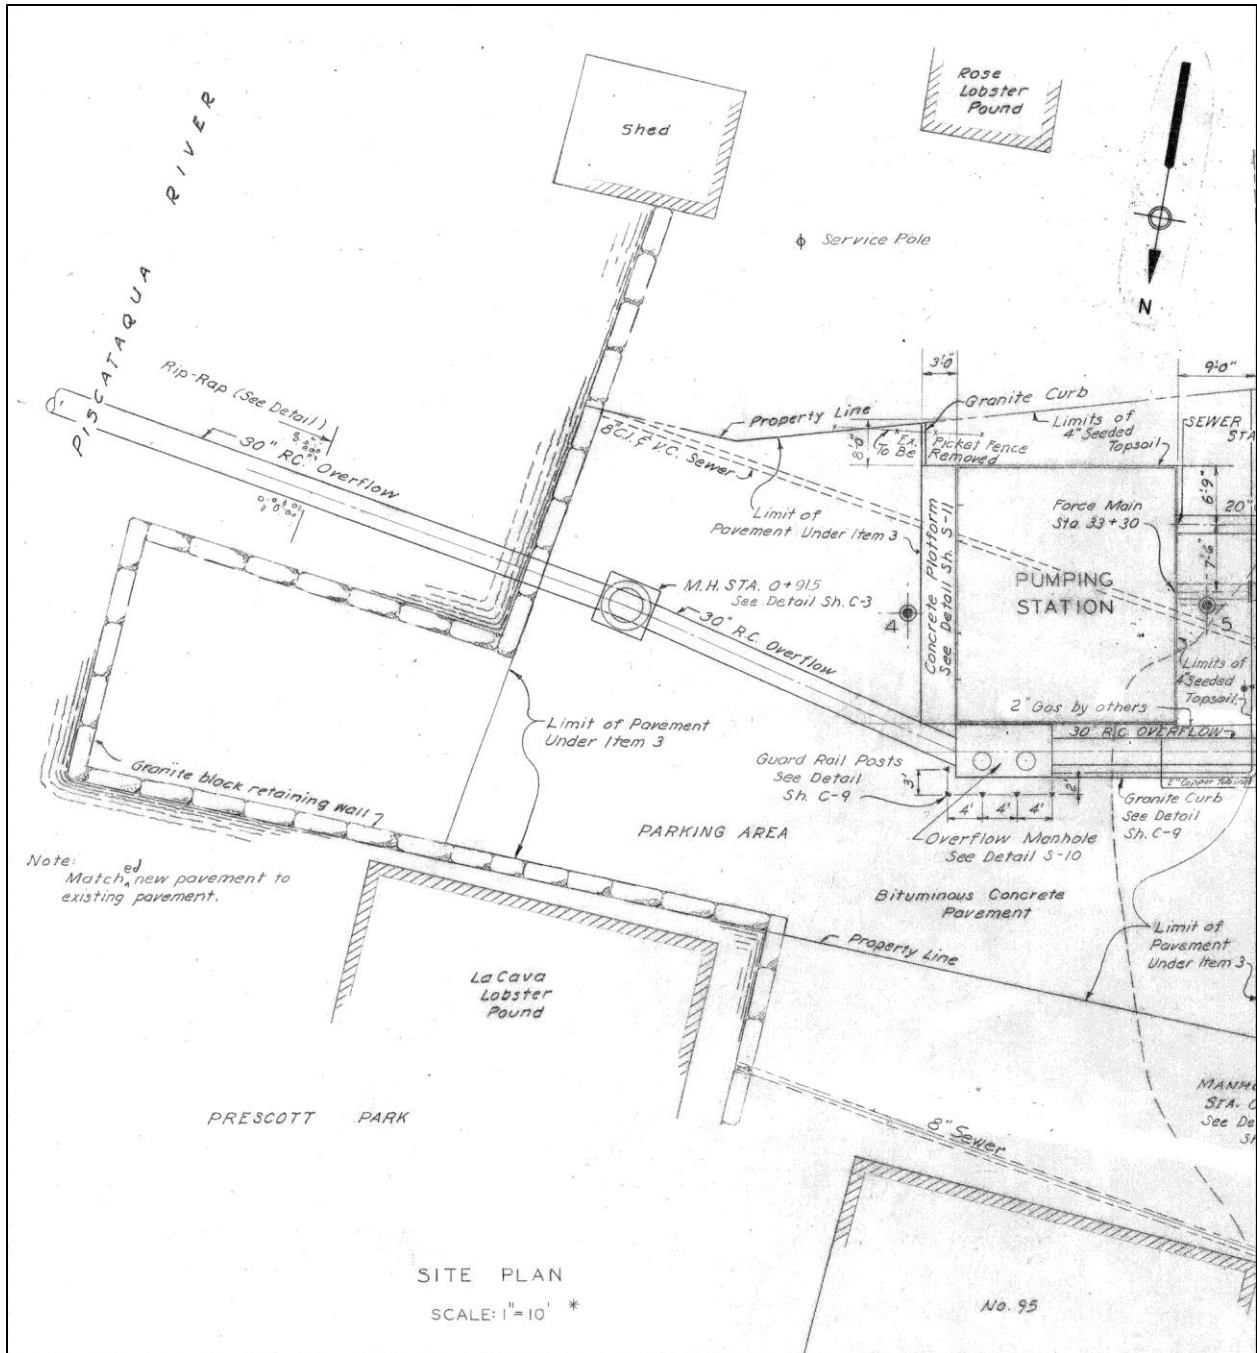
Record drawing of Portsmouth Sewage Treatment Plant, Mechanic Street Pump Station, March 1963, showing "LaCava Lobster Pound" prior to extension of wharf out to line of granite retaining wall. Note 8" sewer outfall discharging out stone bulkhead at lobster pound. Plans show this line was capped and connected to new 30" trunk feeding the pump station. Clip from sheet C-11, "Pumping Station, Gates and Mechanic Street Site Plan & Overflow" (Metcalf & Eddy, 1963).
